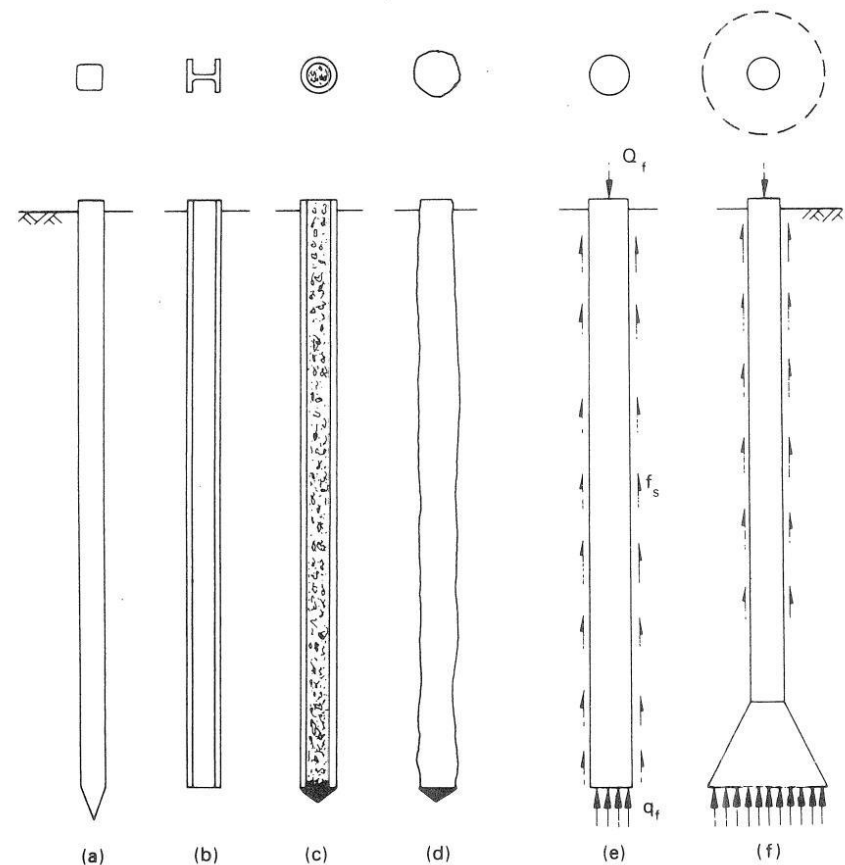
Principal types of pile: (a) precast RC pile, (b) steel H pile, (c) shell pile, (d) concrete pile cast as driven tube withdrawn, (e) bored pile (cast *in-situ*), (f) under-reamed bored pile (cast *in-situ*).
